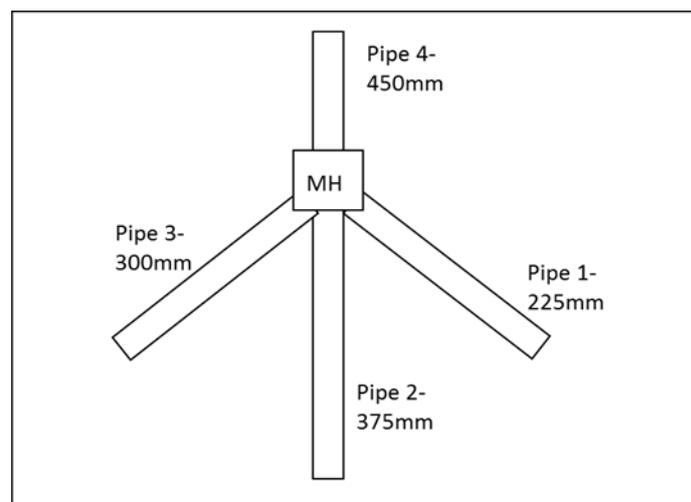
Arrangement of culvert under Beech Lane, Flexford
